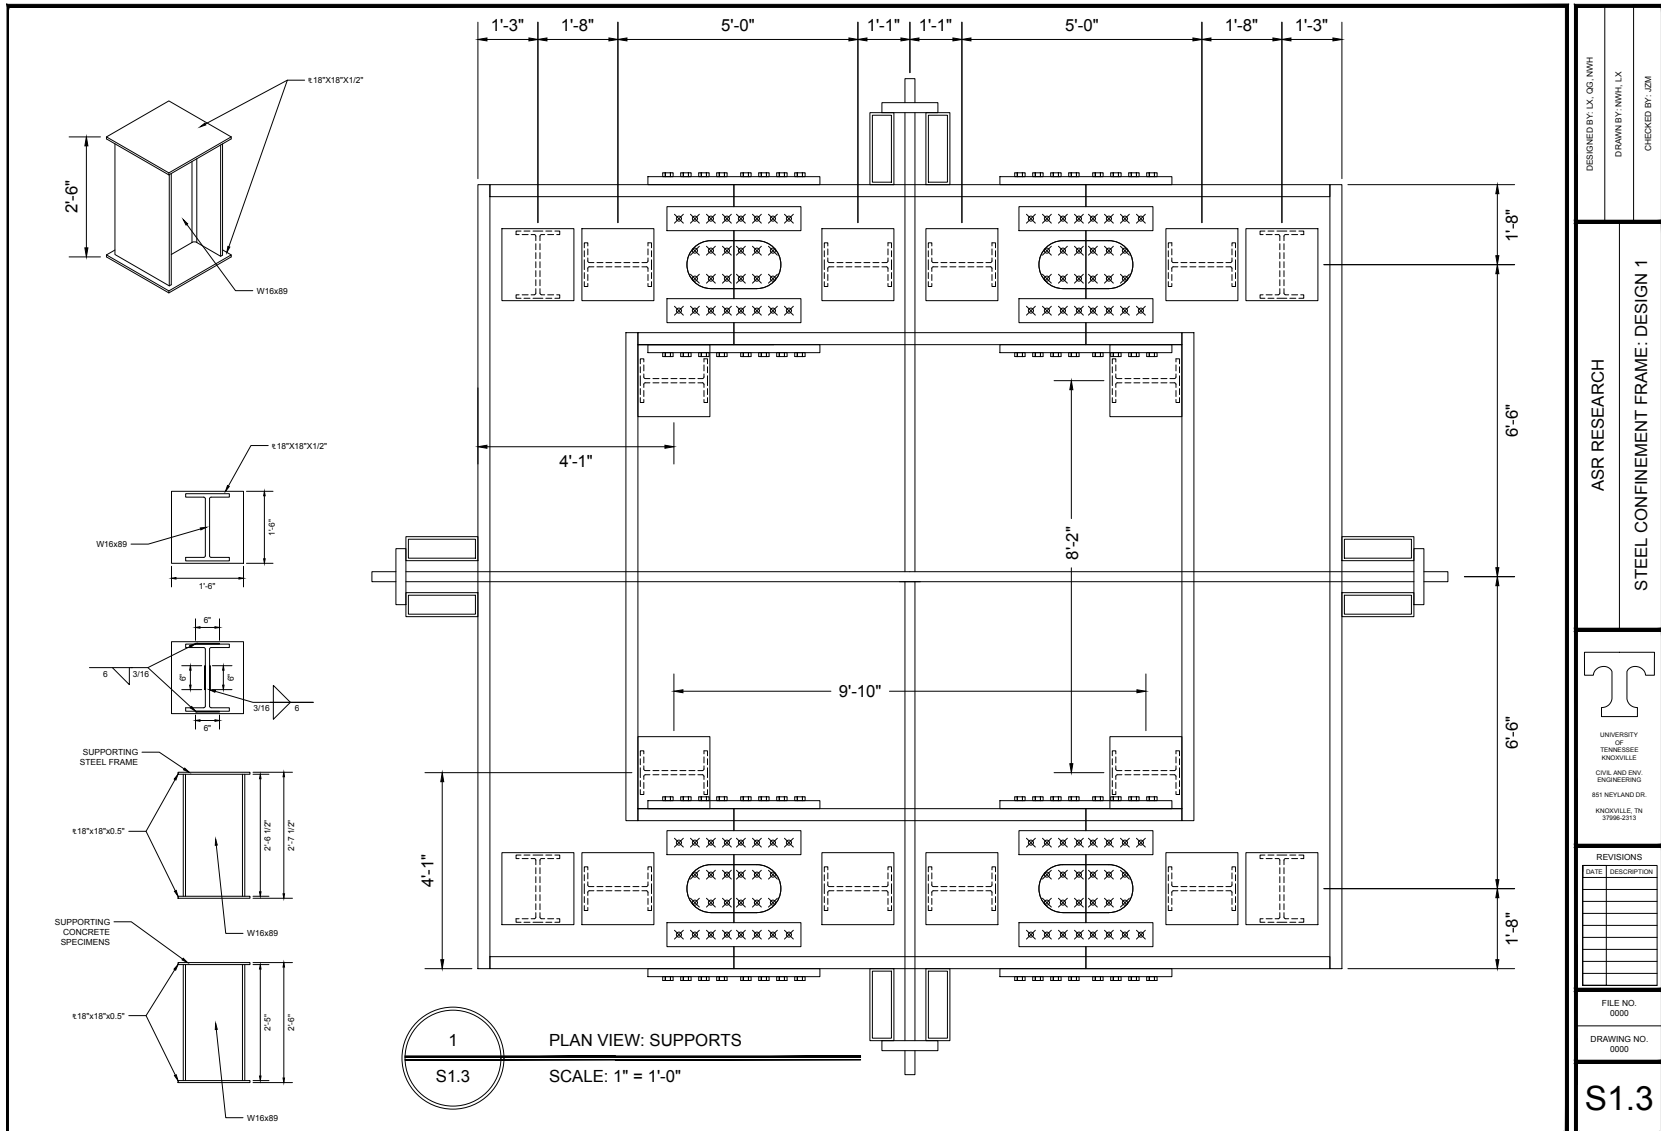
Design drawings of steel supports elevating concrete specimens and confinement frame.
